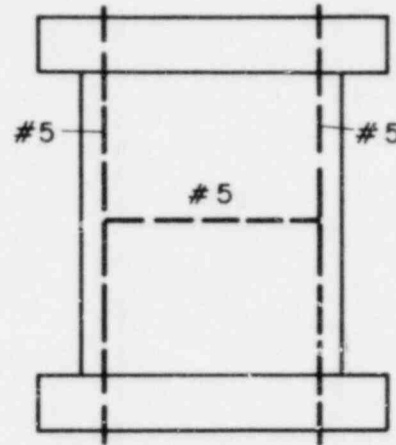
(a) REINFORCING STEEL ARRANGEMENTS FOR HOLLOW CONCRETE BLOCK PIERS (HCBL)
